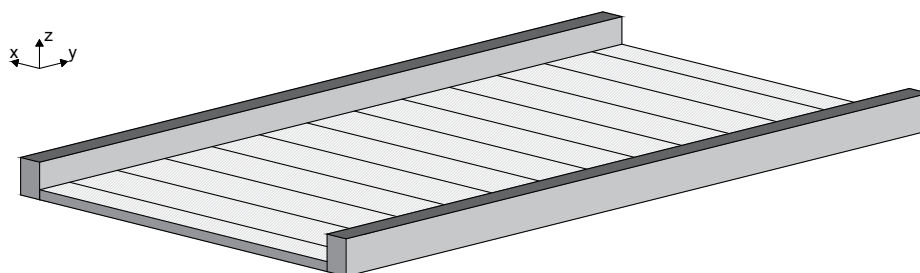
Trough structure design for normal traffic bridges with separate elements
